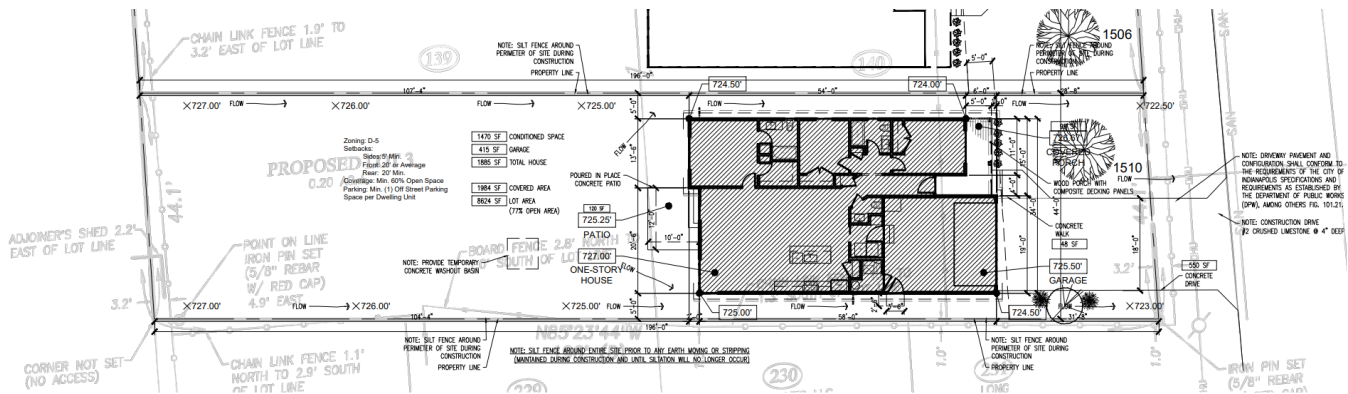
1510 Dunlap Avenue enlarged site plan.
